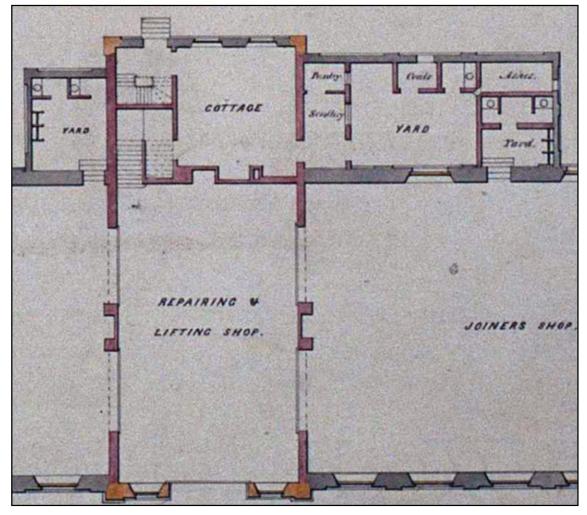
Detail of 1853 plan showing the Cottage and yards.
